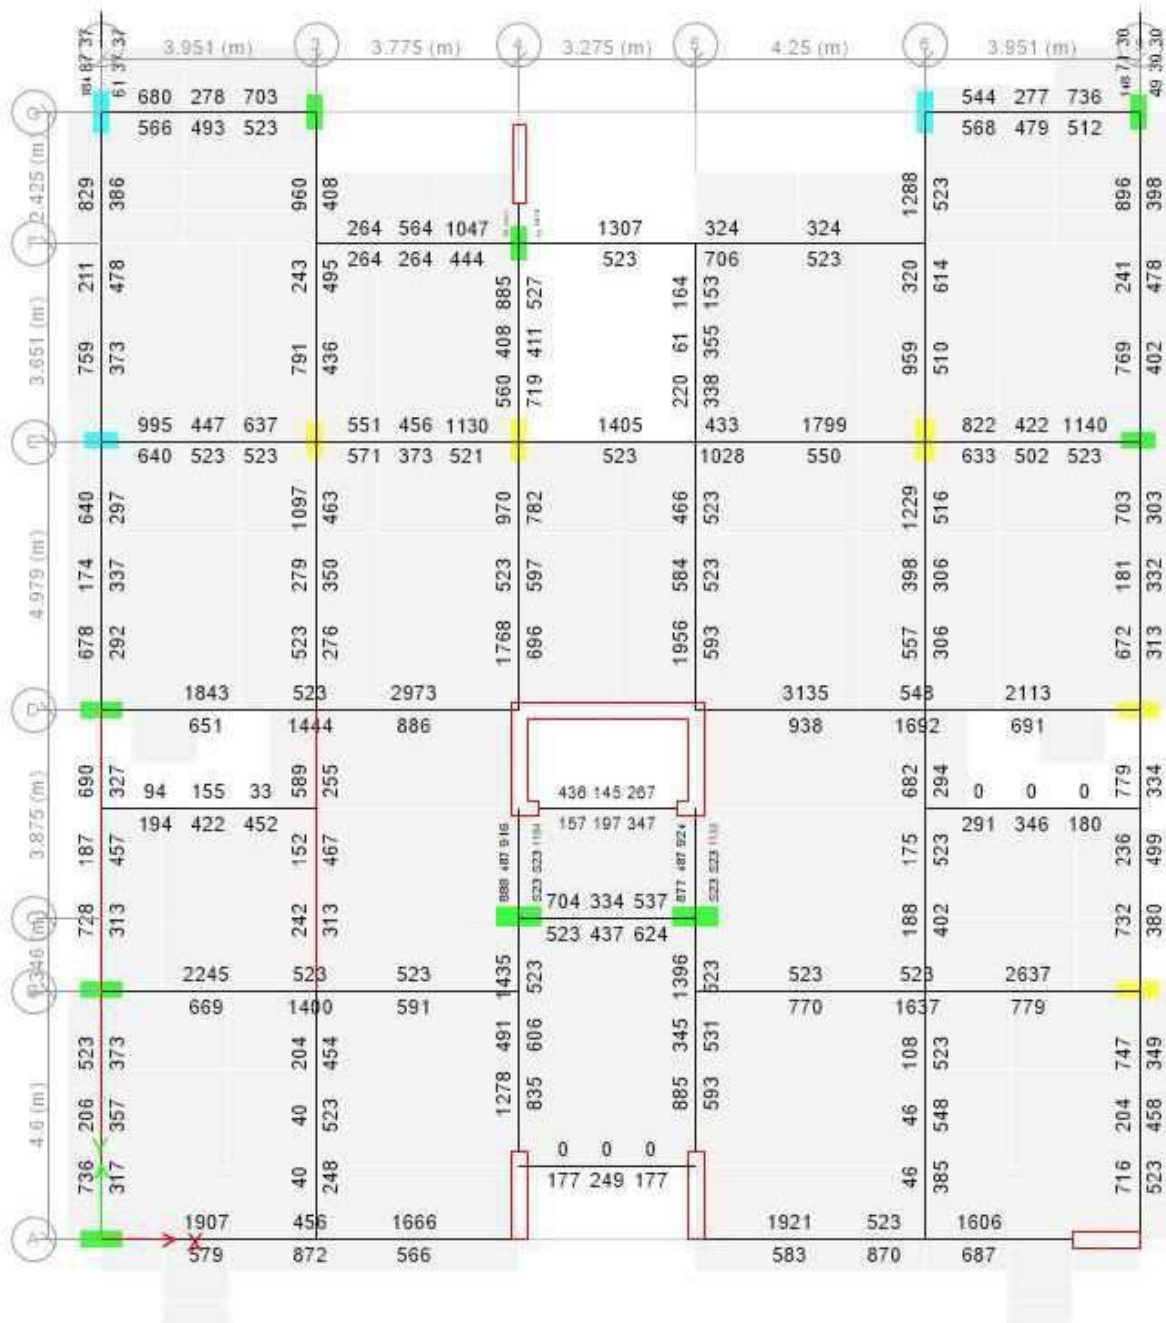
Reinforcement of 8th & 9th Floor Beam (mm²)
